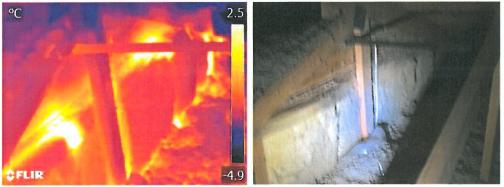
Heat loss at top of boardroom wall Photo 34: Location of thermal image
